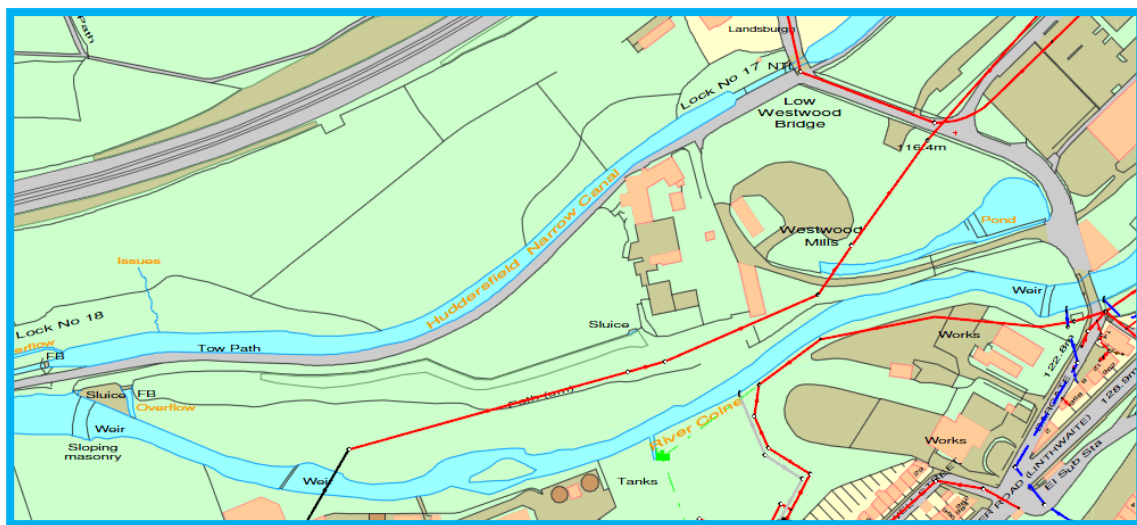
Sewer record plan showing foul sewer along spine road, with an existing manhole suitable for connection below the label 'Westwood Mill'.
